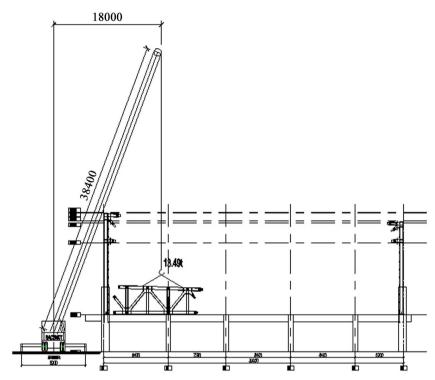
Elevation of south end truss hoisting and assembly 图 3. 北端桁架吊装及拼装立面图
